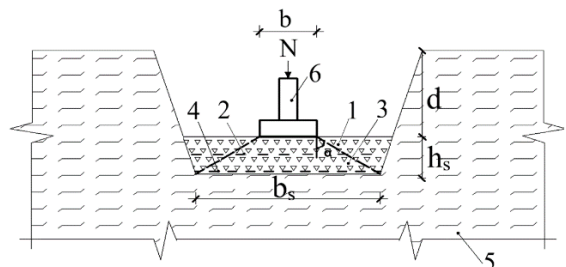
Cross-sectional scheme of the reinforced foundation base: 1 – top crushed stone cushion; 2 – upper geogrid reinforcement; 3 – bottom crushed stone cushion; 4 – lower geogrid reinforcement; 5 – natural foundation soil (loam); 6 – column foundation
